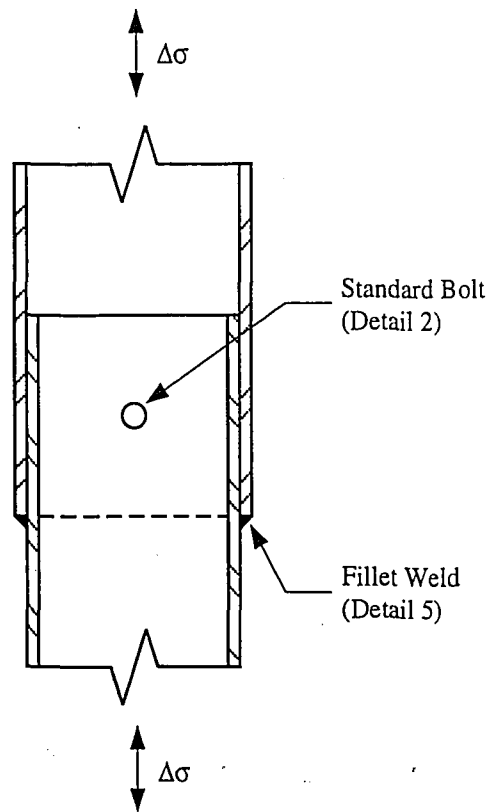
Fillet-Welded Lap-Splice.
